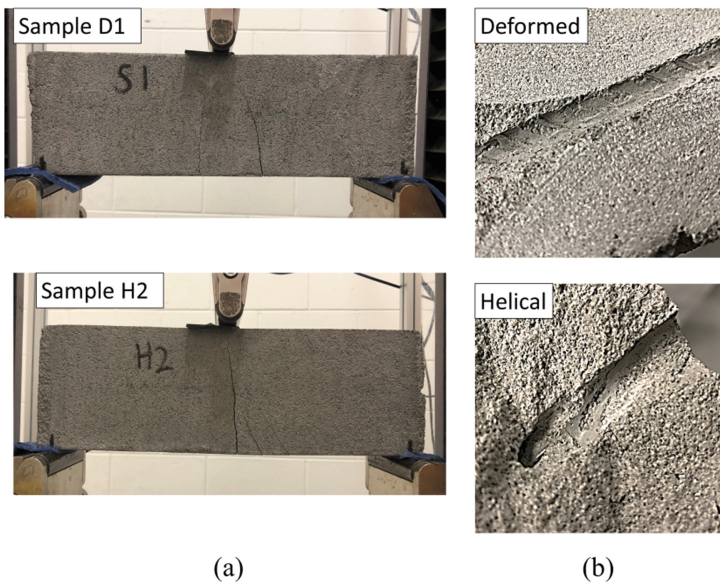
a) Sample D1 and H2 in the 3-Point bending test showing flexural cracking; b) A close-up picture of the bond impressions left in the printed concrete beams showing the deformed bar with a much better bond area than that of the helical bar.
